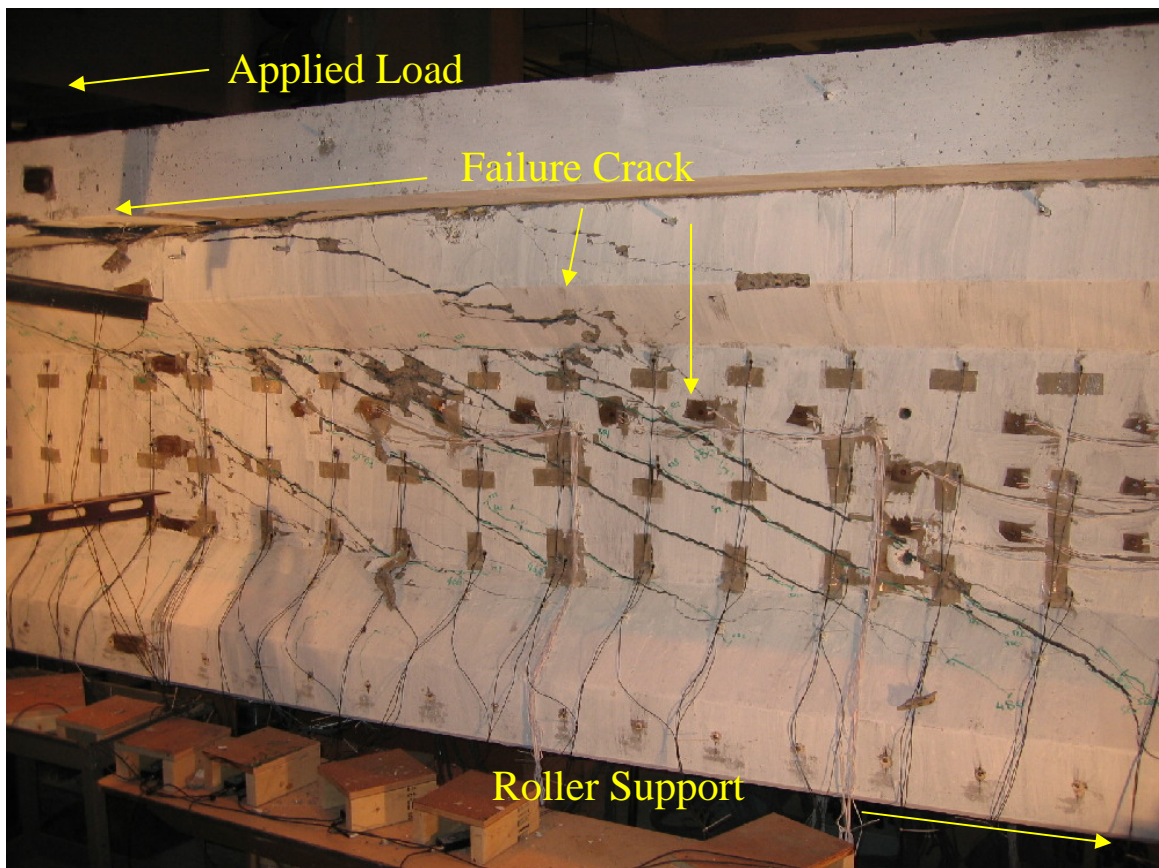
Photograph of Cracking at 40% Past Peak Applied Load (Specimen I)
